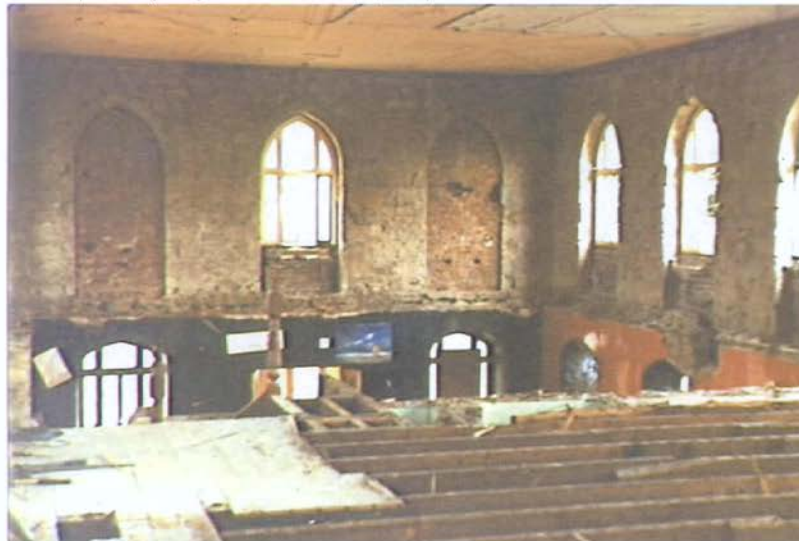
The floor inserted in 1888 in the process of being removed, looking west. Source: Campbelltown City Library. Local Studies Collection (02/002844)
